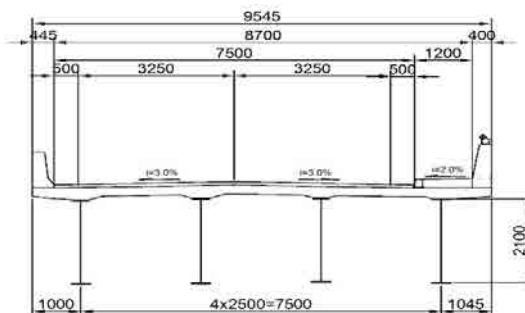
Kapiura Bridge Main Girder Arrangement
